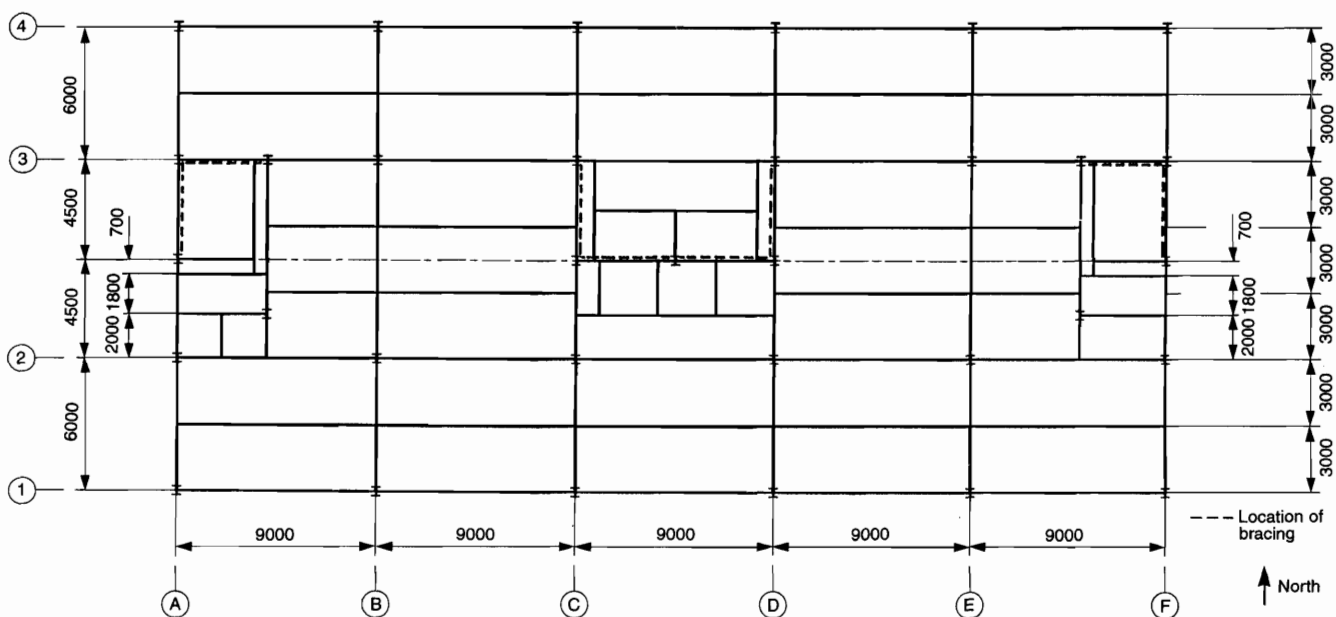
A plan drawing of the building showing the beam and column layout for floors 3 to 7
